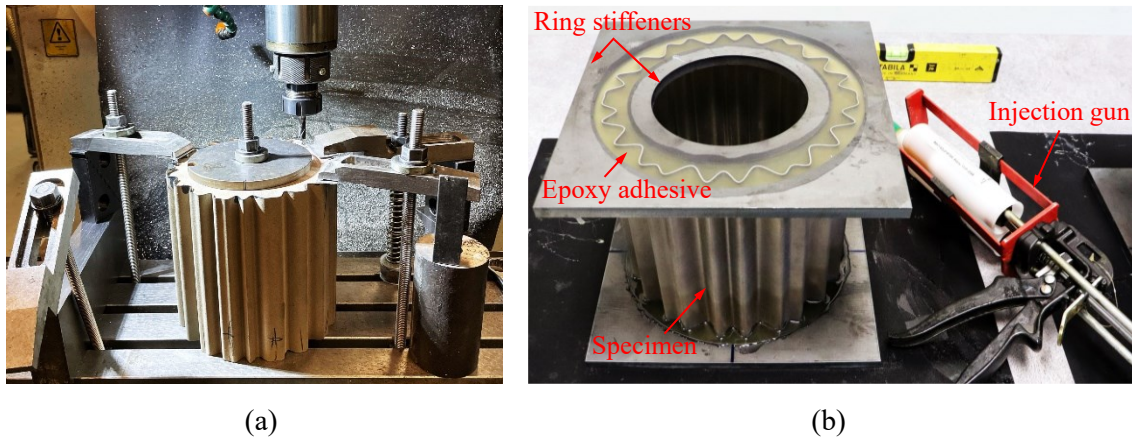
Shell specimen preparation for testing: (a) end machining and (b) potting
